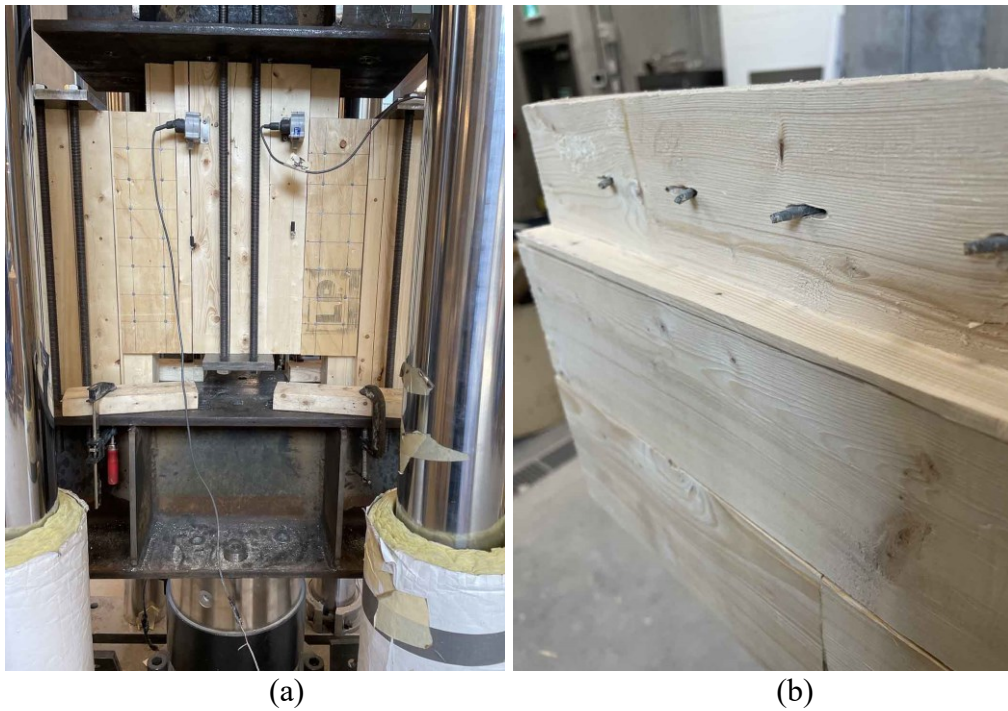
Galvanized spiral 3.4×63.5 mm nail panel-to-panel connections under shear: (a) prior to the test (b) after the test
